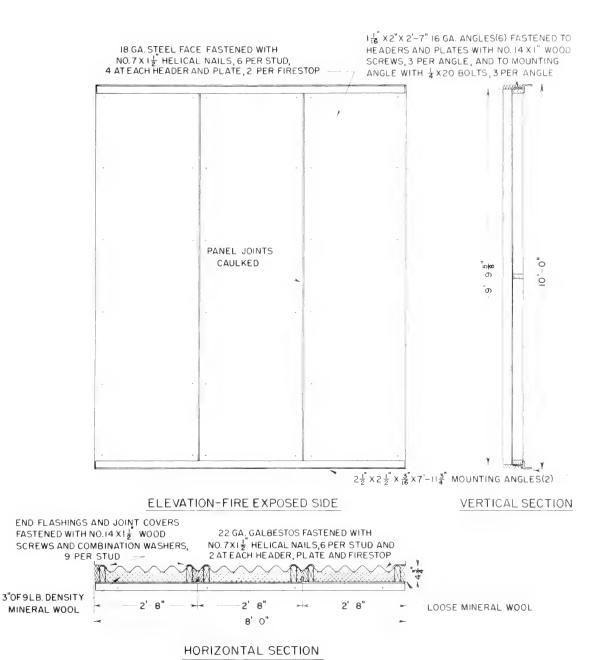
CONSTRUCTION DETAILS OF TEST PANEL NO.3
